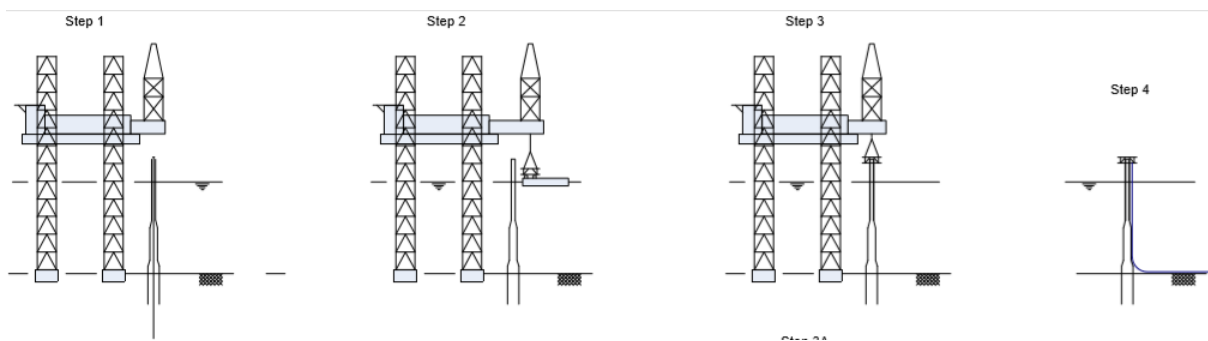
Installation schematic of caisson minimal platform [9]
